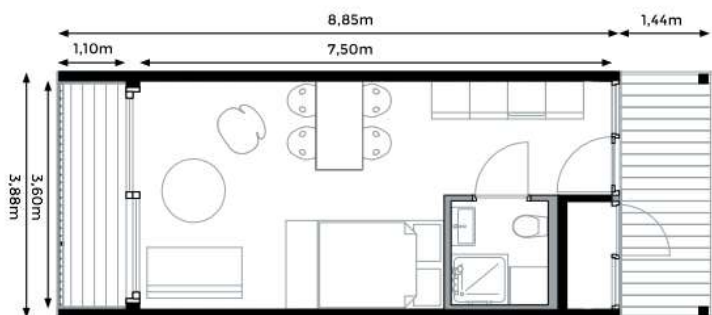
Finch buildings ground plan (Finch Buildings, 2017)
